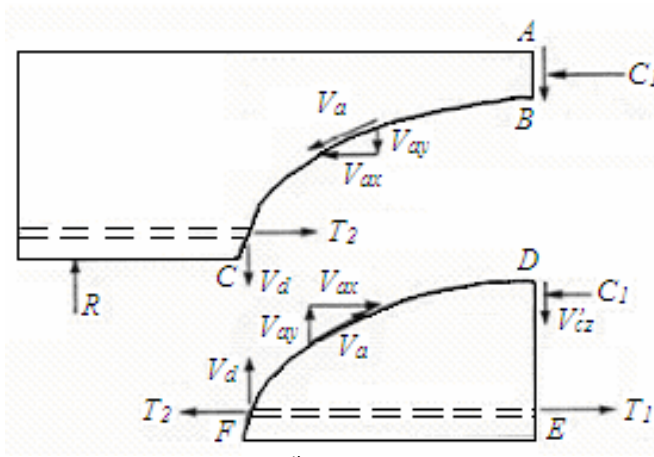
Internal forces in a cracked beam without stirrups, from MacGregor (1997).
